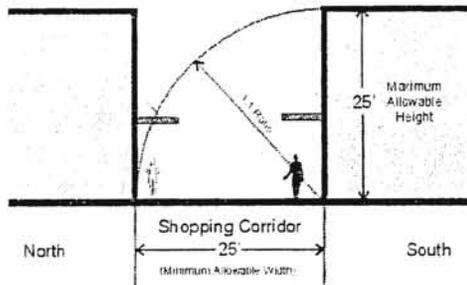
Building heights on the south side of major open spaces, such as the Shopping Corridor, shall not exceed to 1:1 ratio with the width of the open space.
